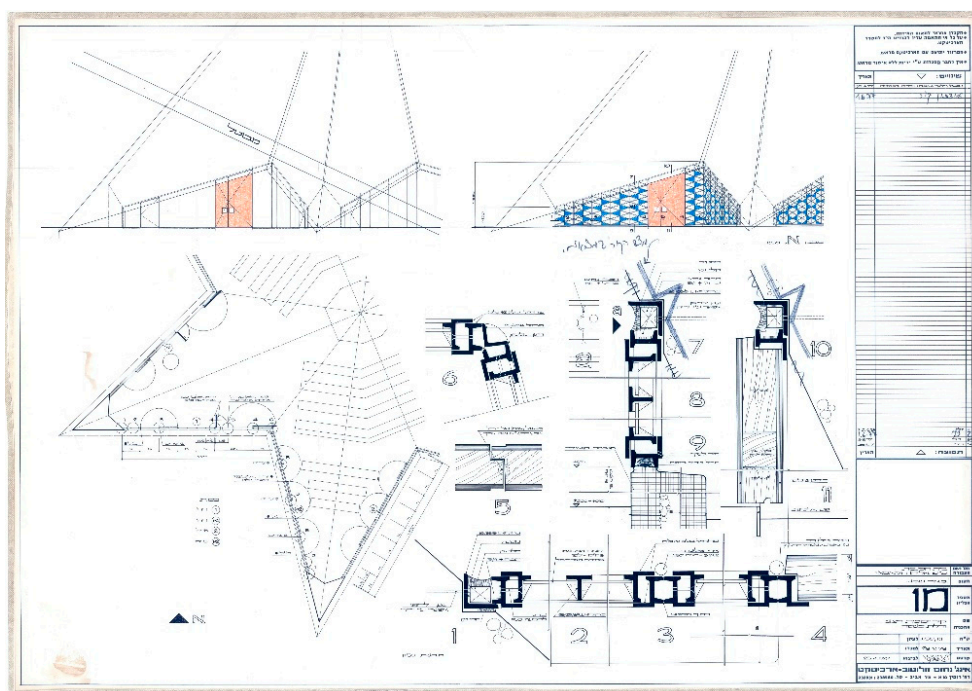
Nahum Zolotov, glass wall and entrance door: plan and sections, 1:50/1:1, 26.12.76.
